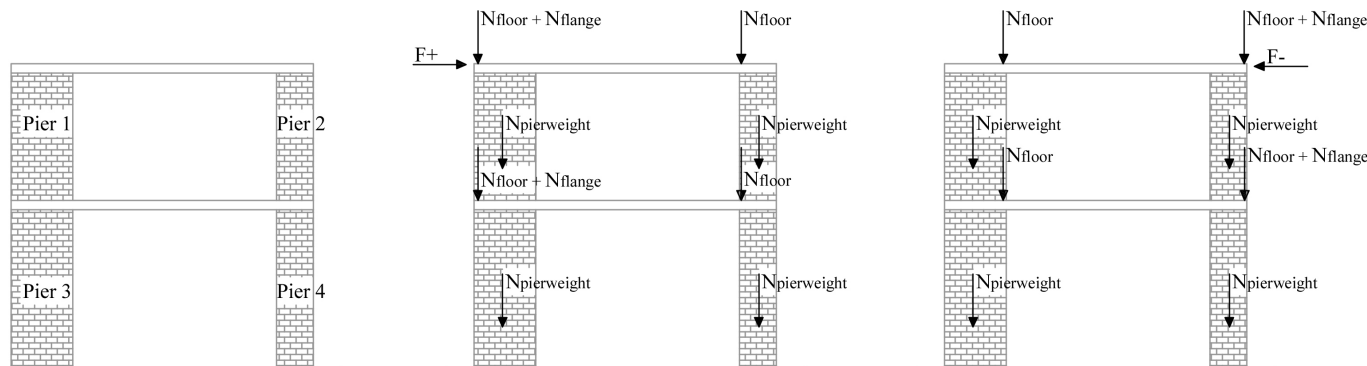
Schematization of piers if the the first floor level is imposed at the piers
